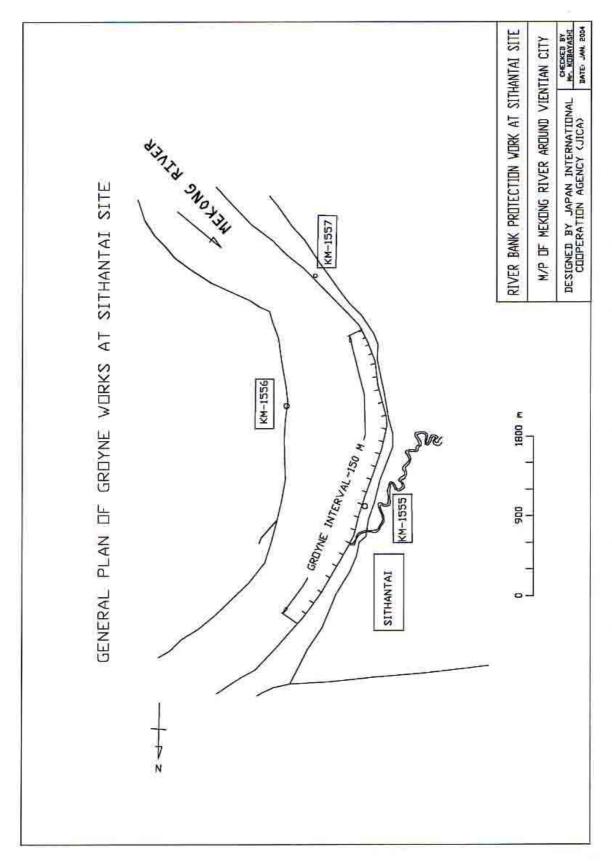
General Plan of Grovne Works at Sithantai Site
